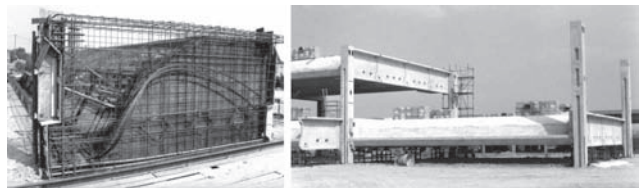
Views of the folded plate prefabricated cage and of the assembling and erection procedure
